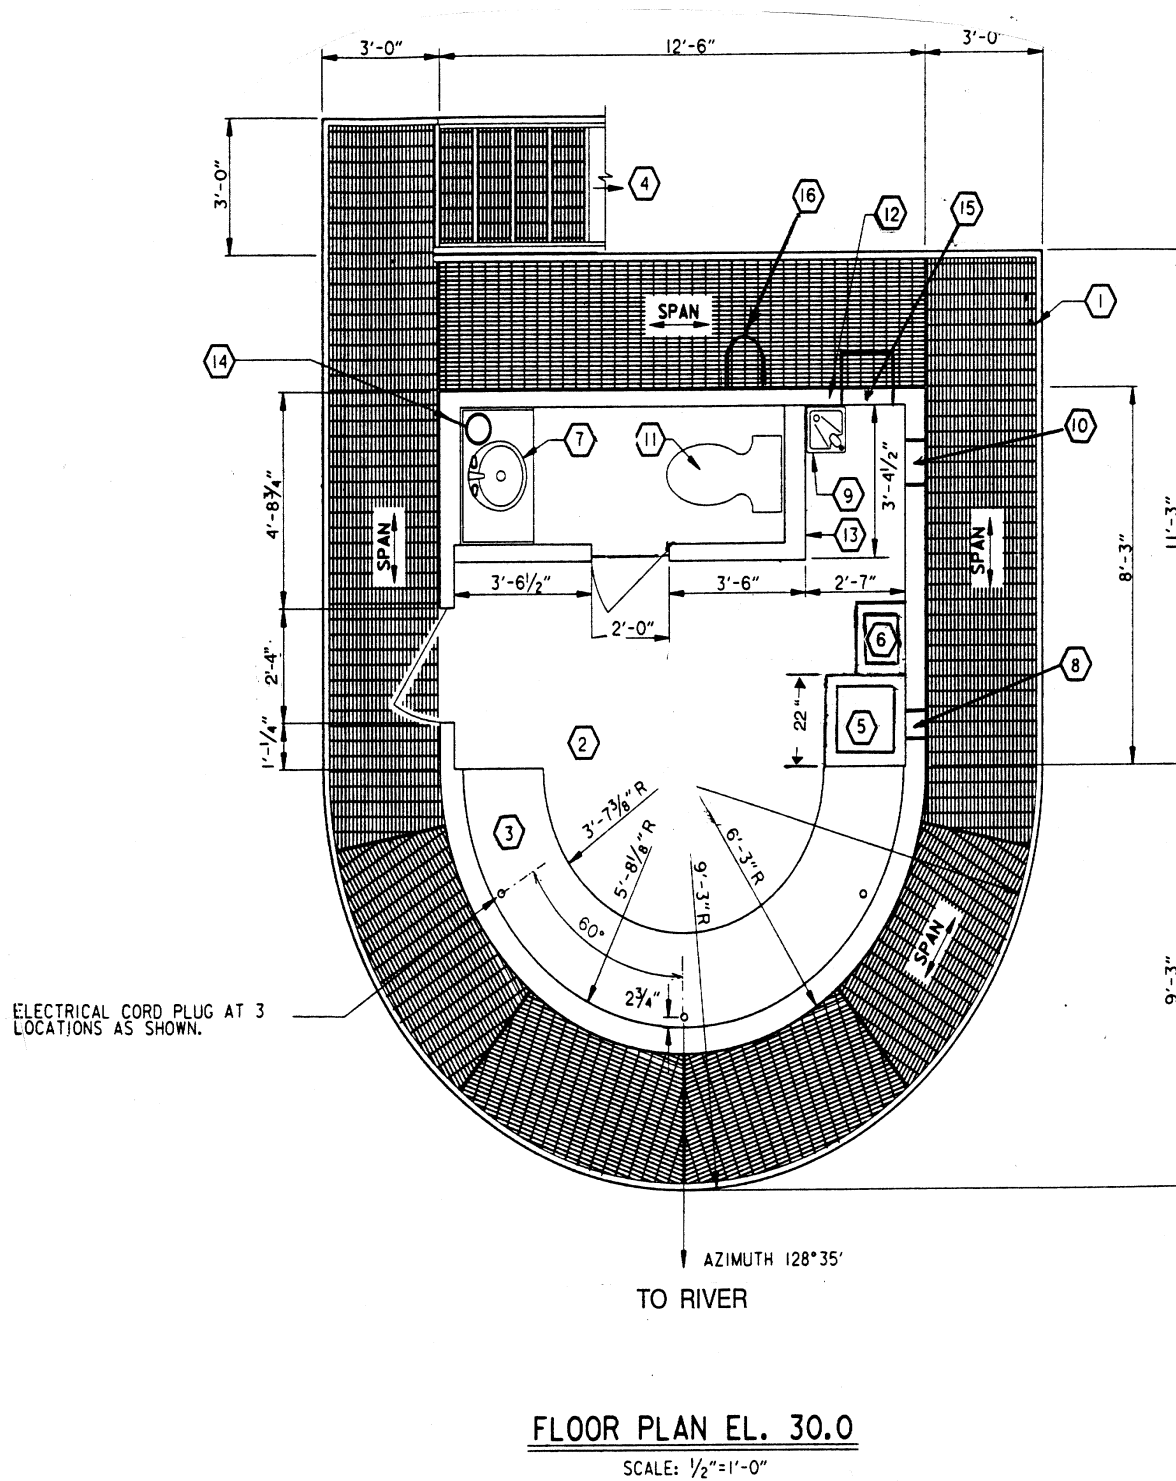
Gretna Light Facility Layout Sketch - Operator's Room
